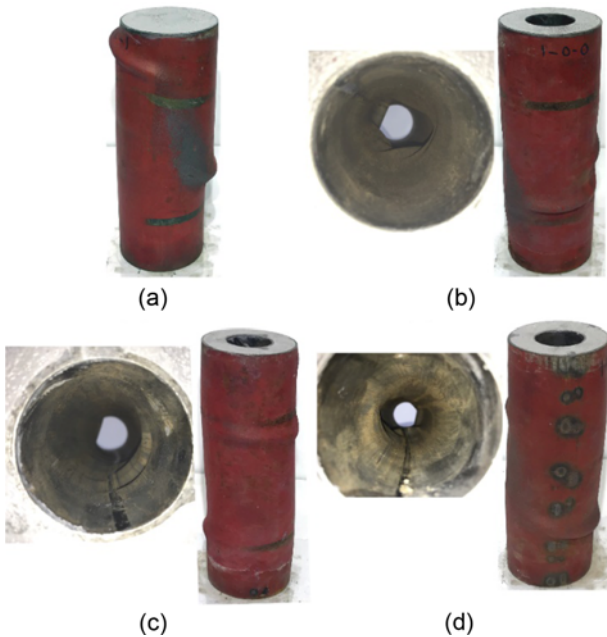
Failure Modes of: (a) C-1 Specimen, (b) 1-W0-0 Specimen, (c) 1-W60-3 Specimen, (d) 1-W114-3 Specimen
